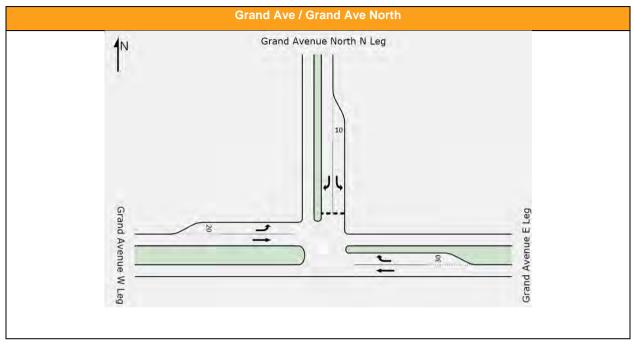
Intersection Layout – Grand Avenue/Grand Avenue North
